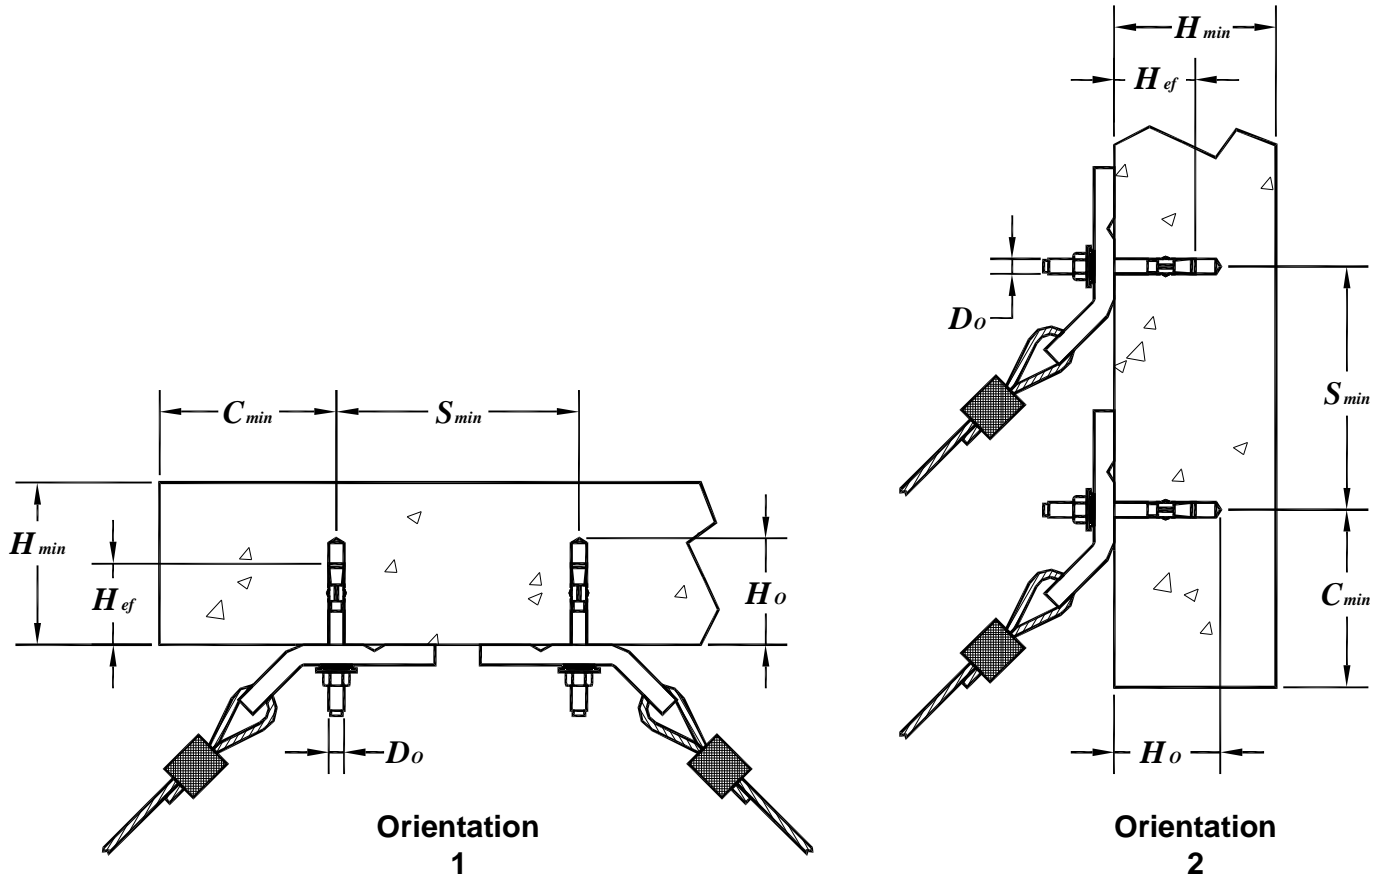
; Typical KSCA Bracket Installation in Normal Weight Concrete
